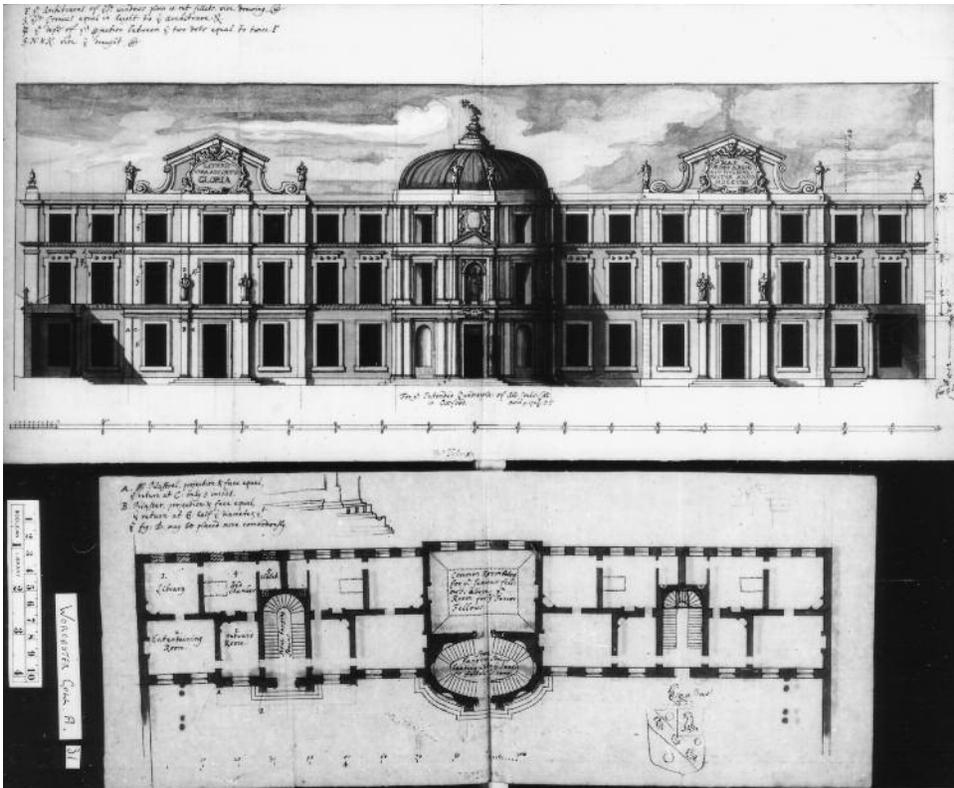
above. John Talman, elevation of the proposed All Souls residential building (Worcester College 36)
